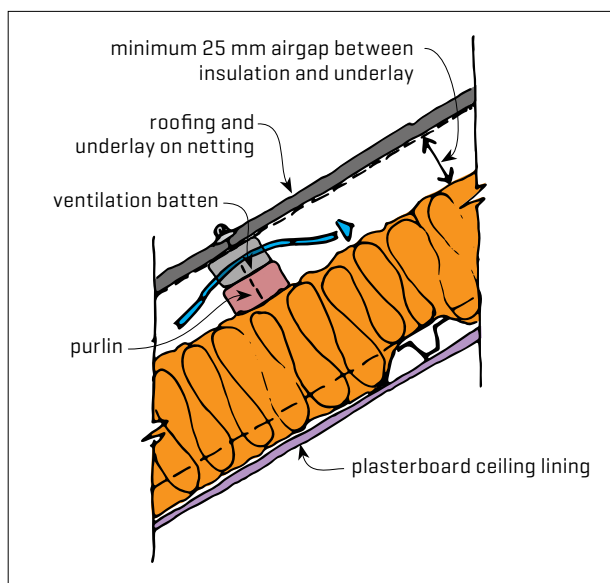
Alternative construction for skillion roof: when insulation abuts purlins, ventilation batten must be added above purlin to allow airflow.
